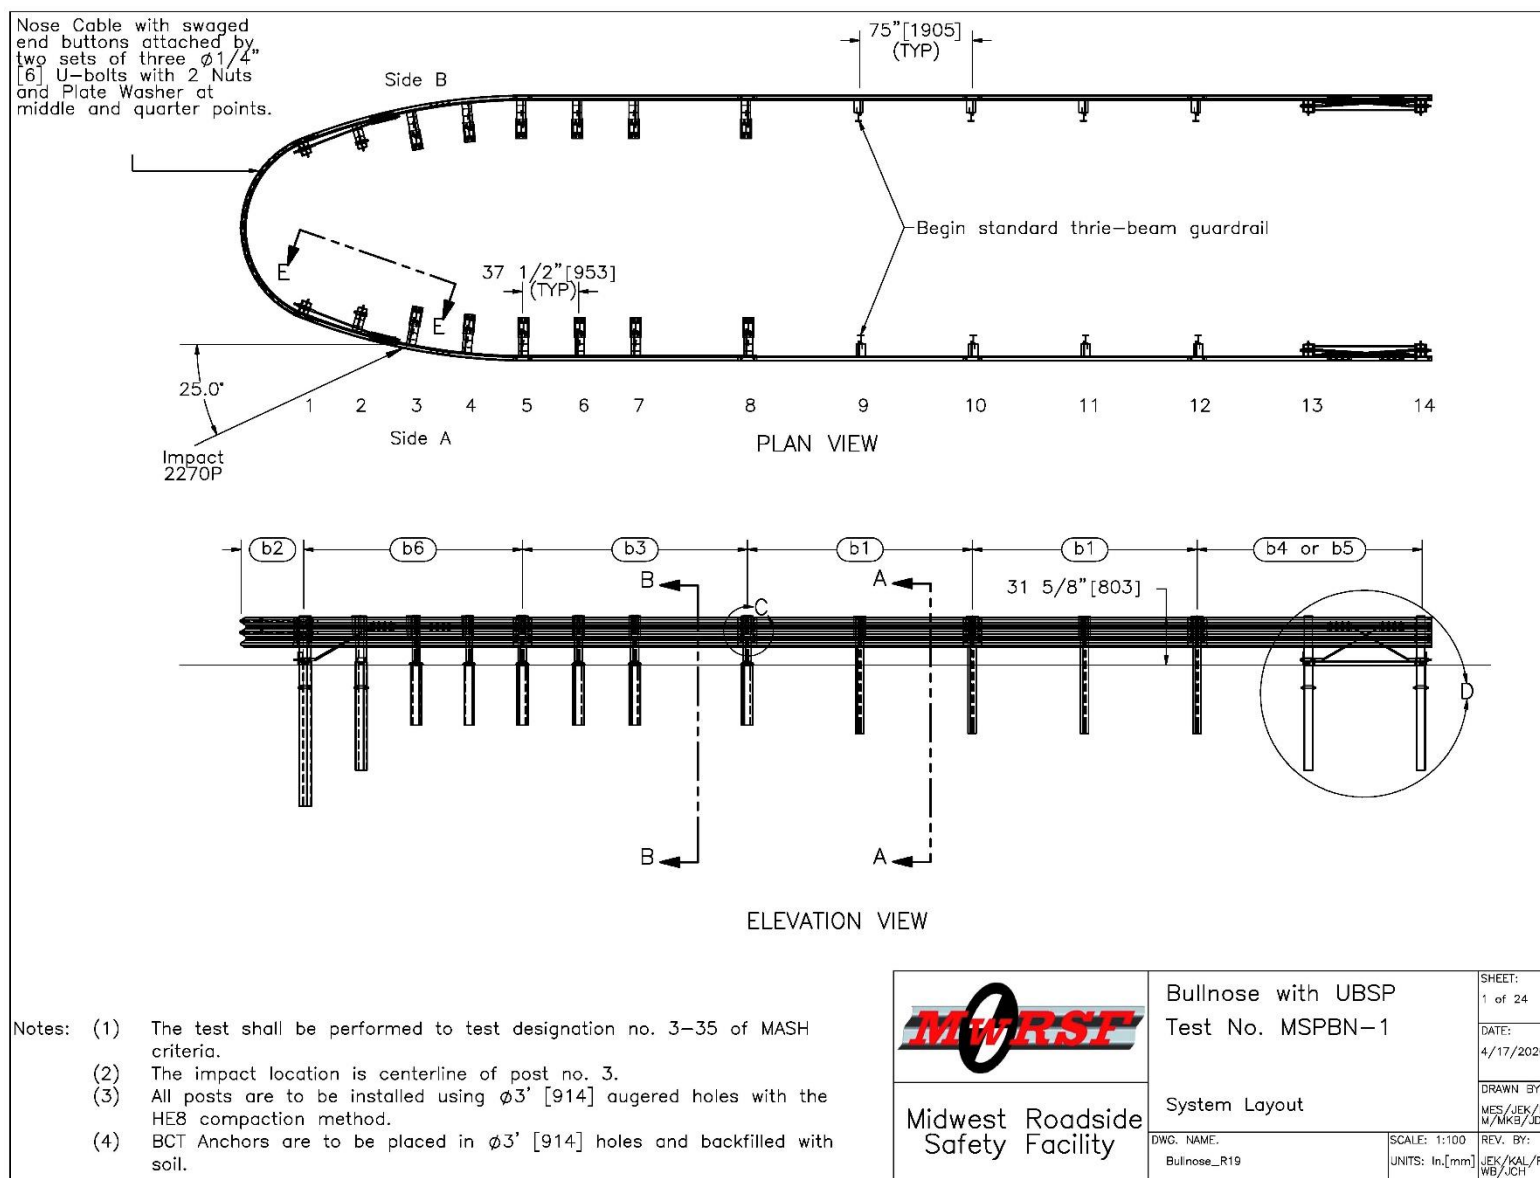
Test Installation Layout, Test Nos. MSPBN-1
